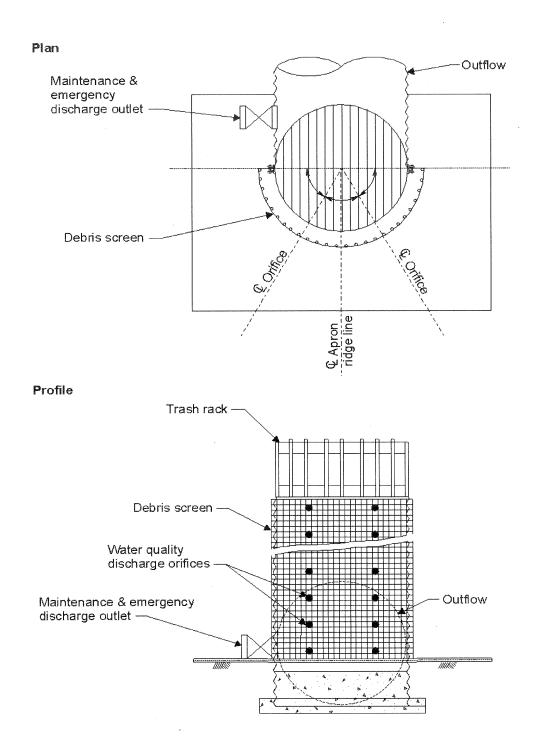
Figure E. Detention Basin Outlet Structure Schematic (Not a Standard Plan)
